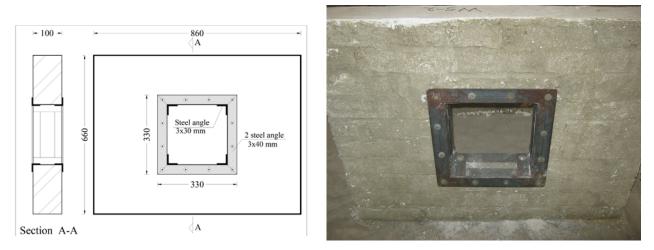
Details of the used rehabilitation technique using steel angle 3x40 mm around opening at both sides welded with steel angle inside opening corners.
